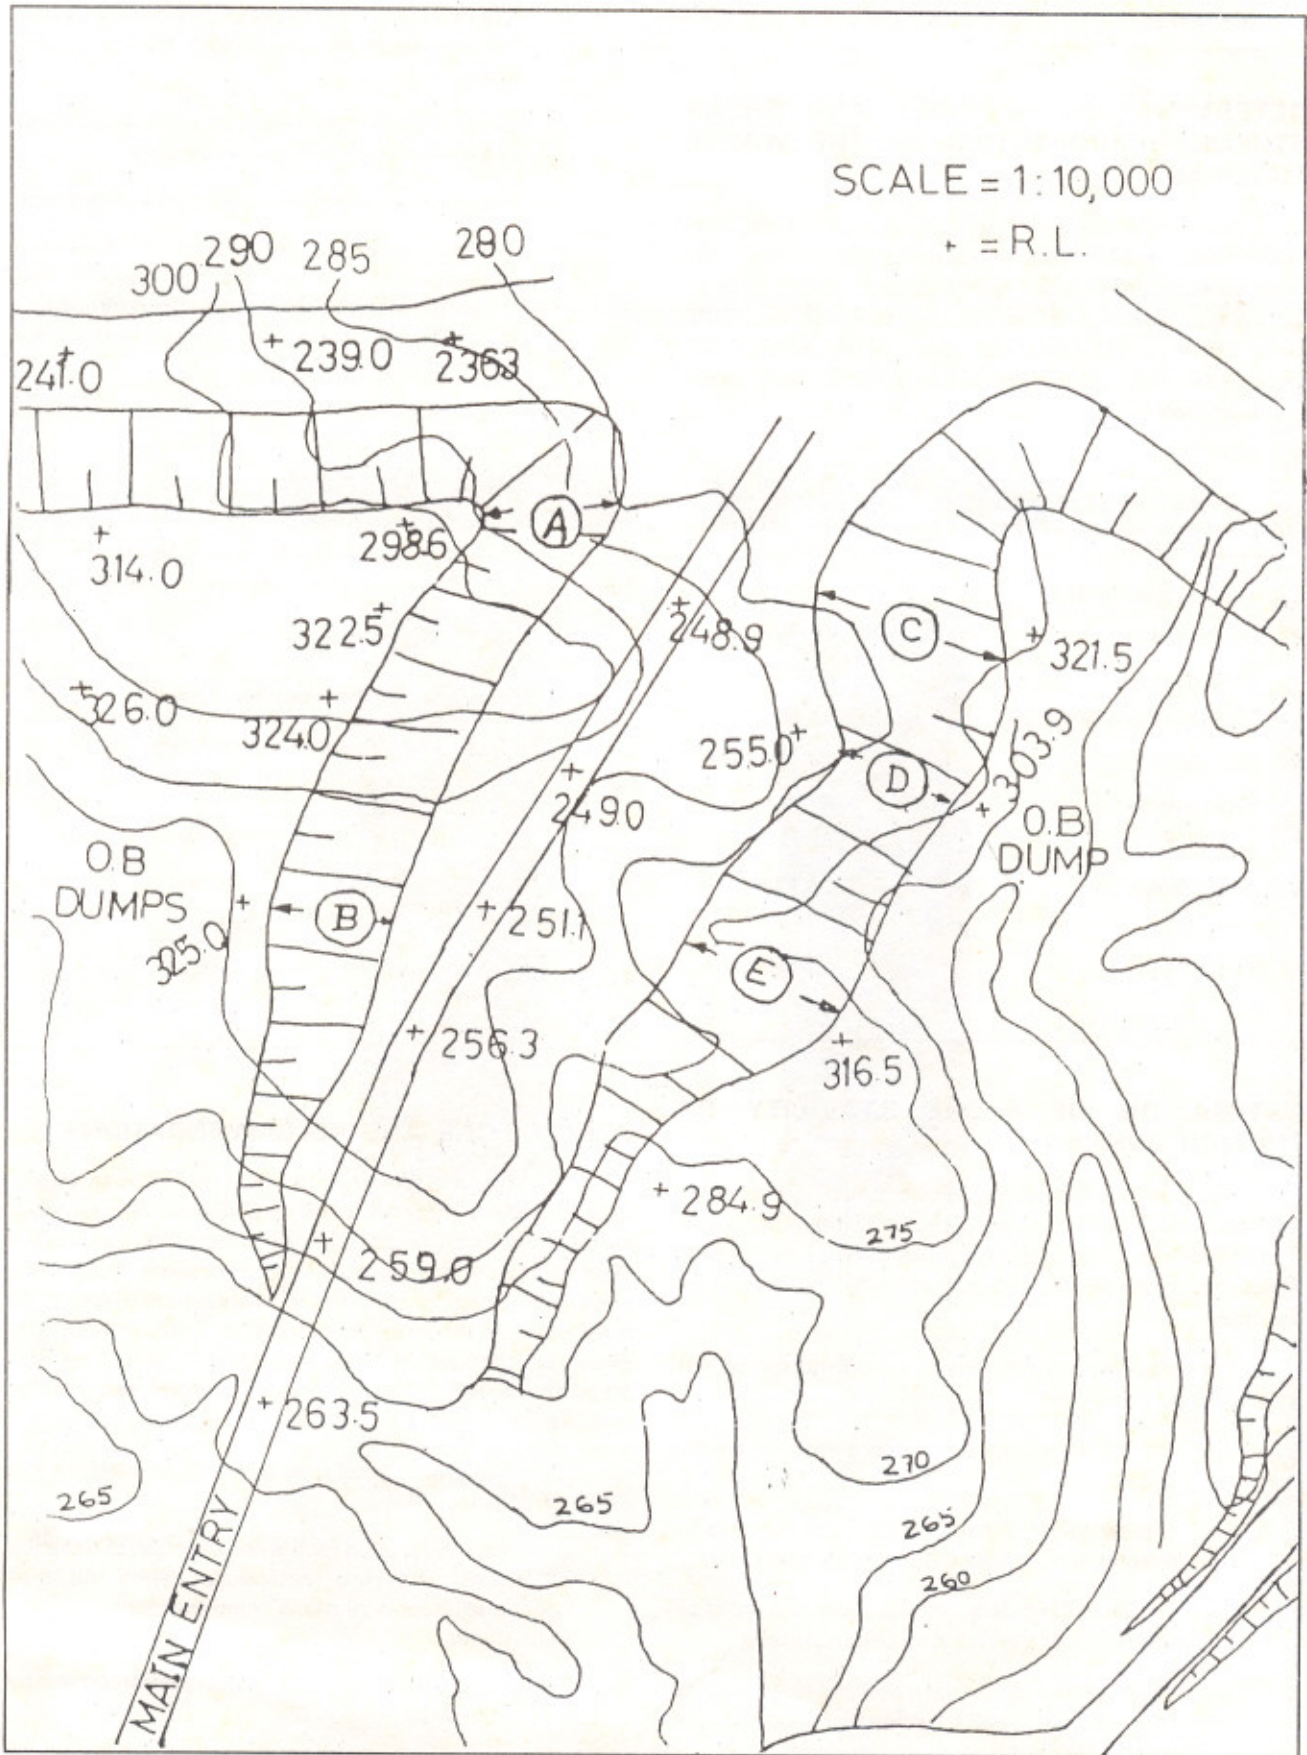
Plan of overburden dumps of an opencast coal mine with R. L. and ground contours
